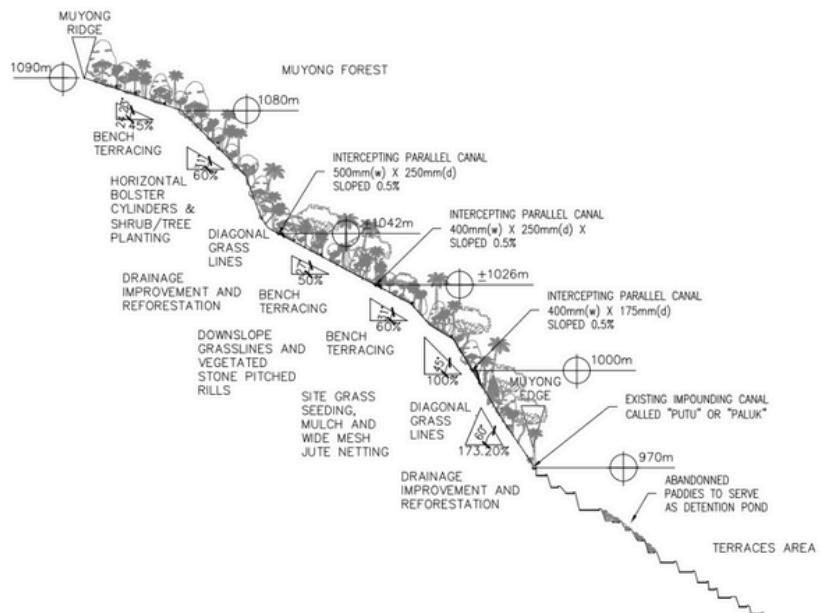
The Blow-up Section at the Scour Alignment Section of the Muyong area showing the layout of the intercepting parallel canals and the existing impounding canal below and right next to the terraces.
